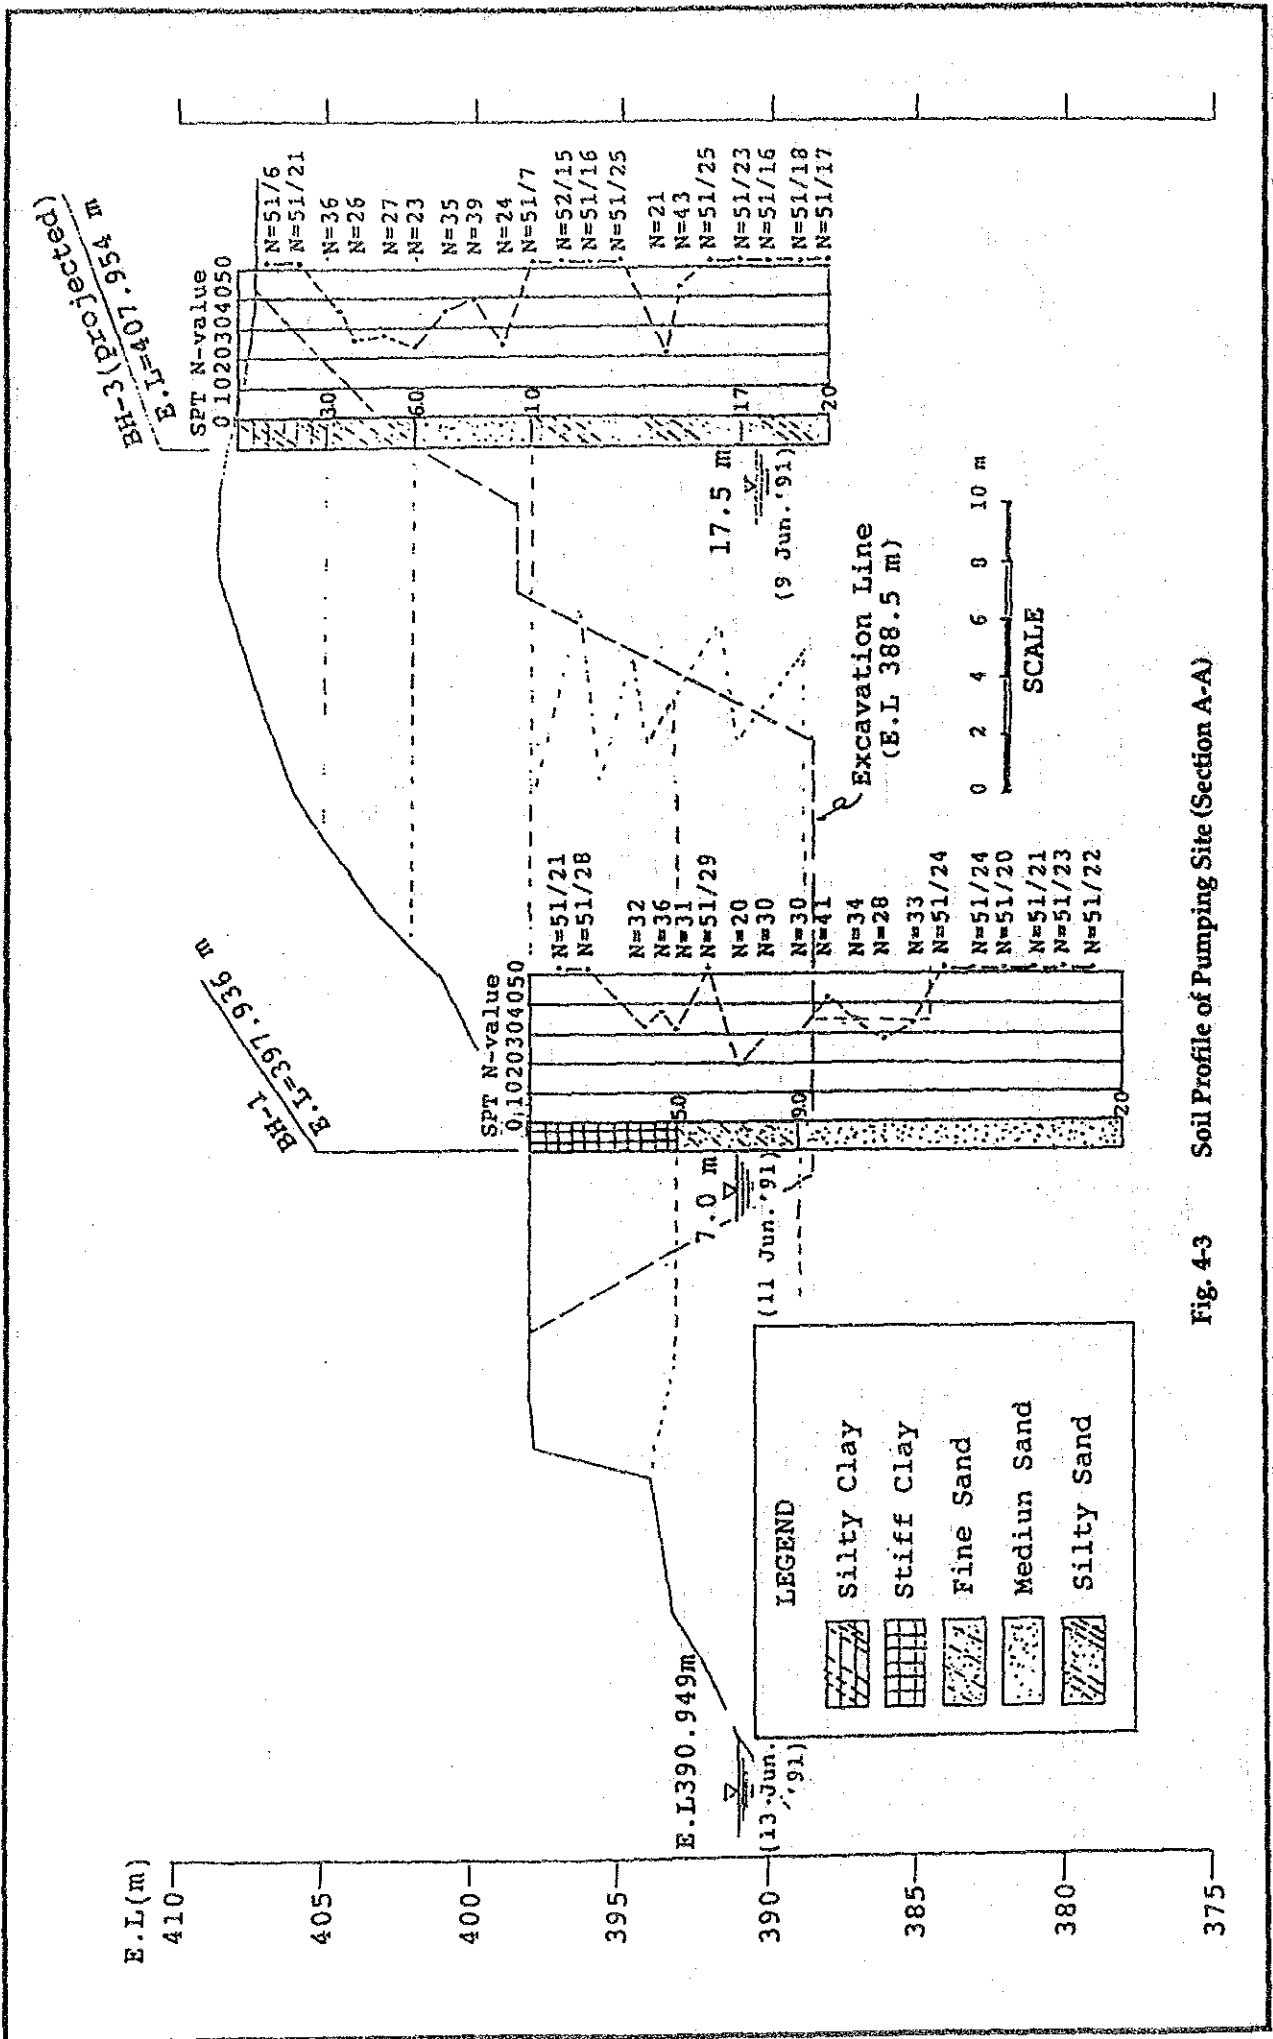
Soil Profile of Pumping Site (Section A-A)
